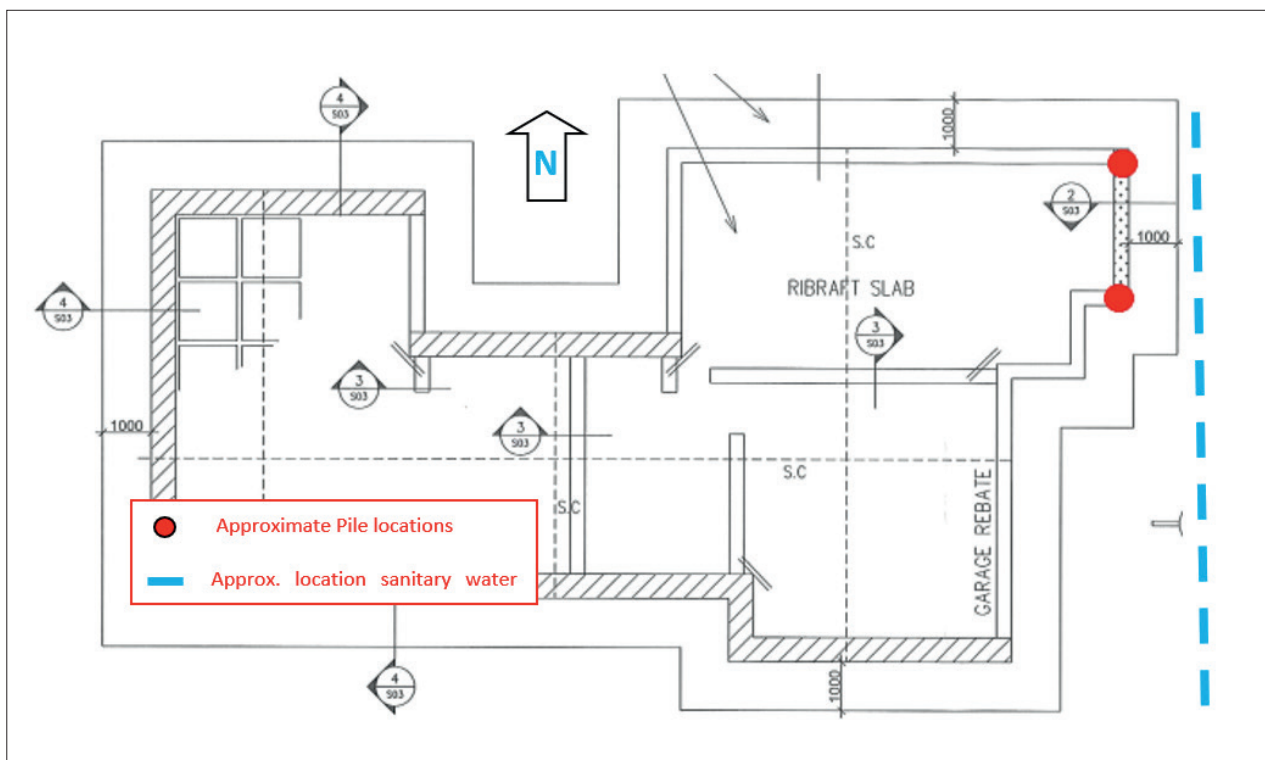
Floor plan layout annotated with pile and sanitary line location
